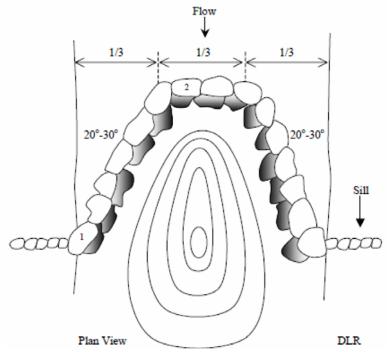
Rock erosion control structures to be constructed in the re-routed Pomme de Terre River Channel.
